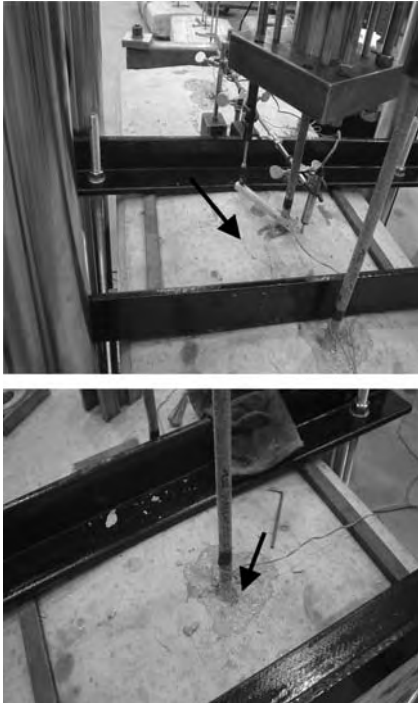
Cracking (A) & spalling (B) of concrete surrounding deformed GFRP rods during pullout tests.
